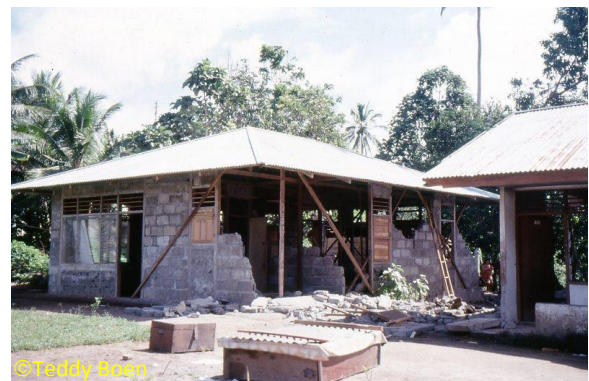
Masonry Buildings Confined with Timber Columns and Beams
